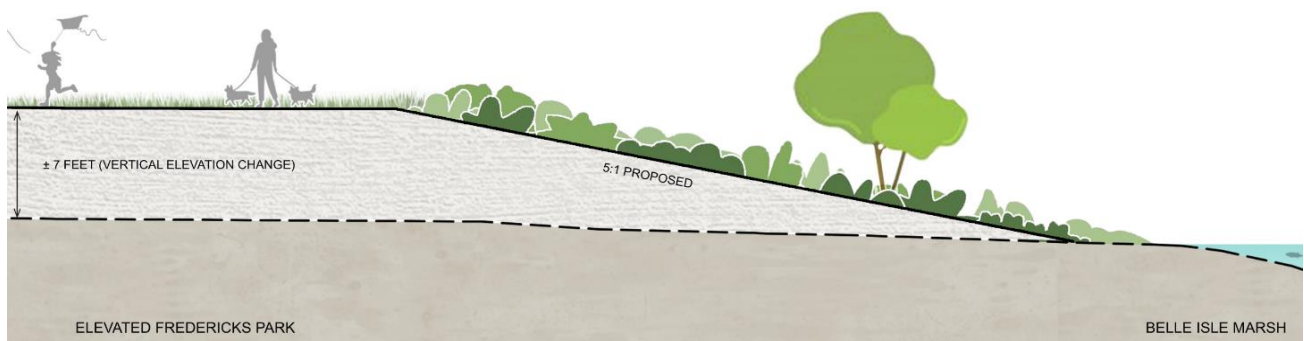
Alternative FP-2: Elevated Park with Seawall—Illustrative Cross Section (Terraink)
